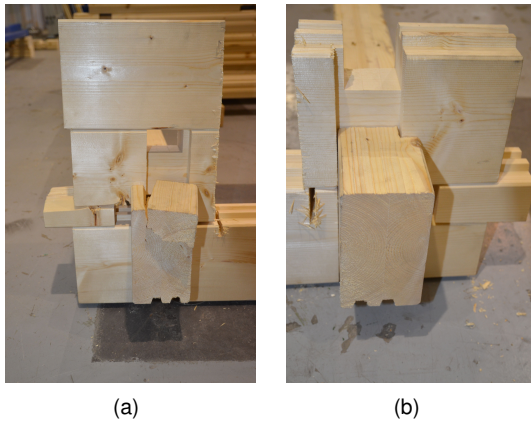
(a) corner joint - "T" - (b) corner joint - "C" .
